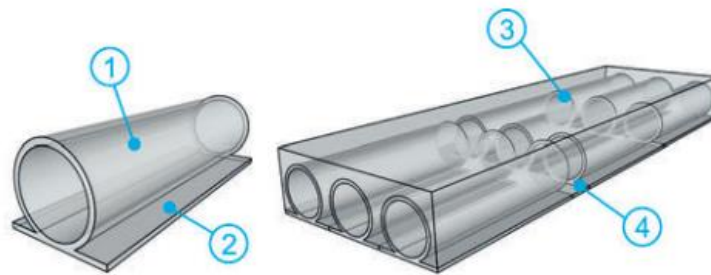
Basic Core Unit and Application into a Floor Slab
